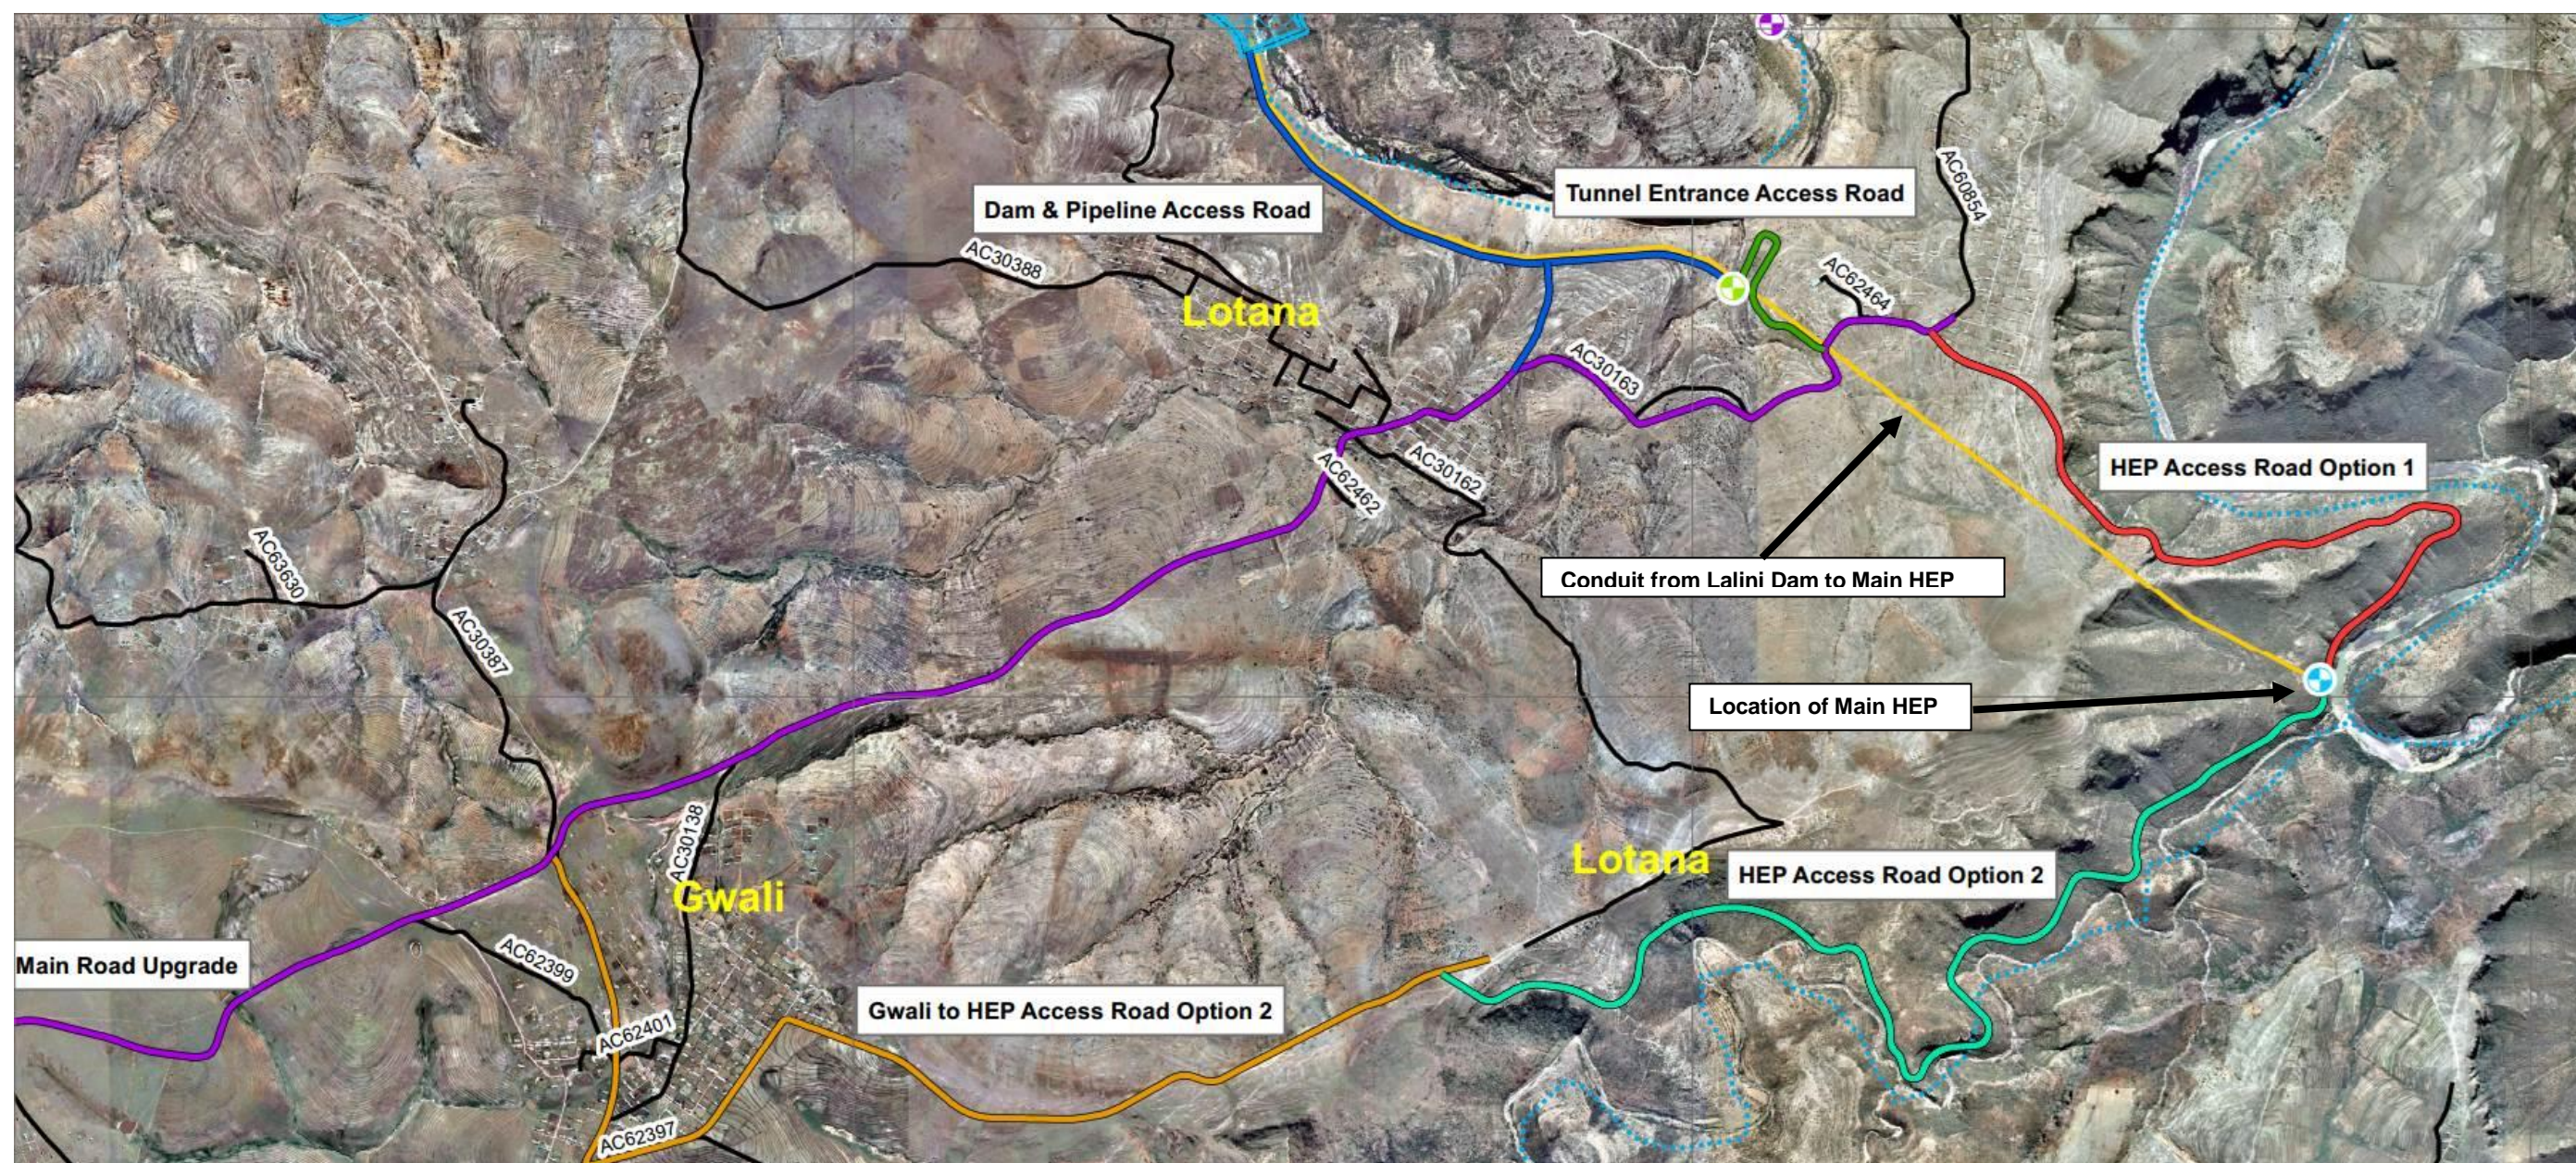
Main Access Road and Other Roads to Lalini Scheme Construction Sites
